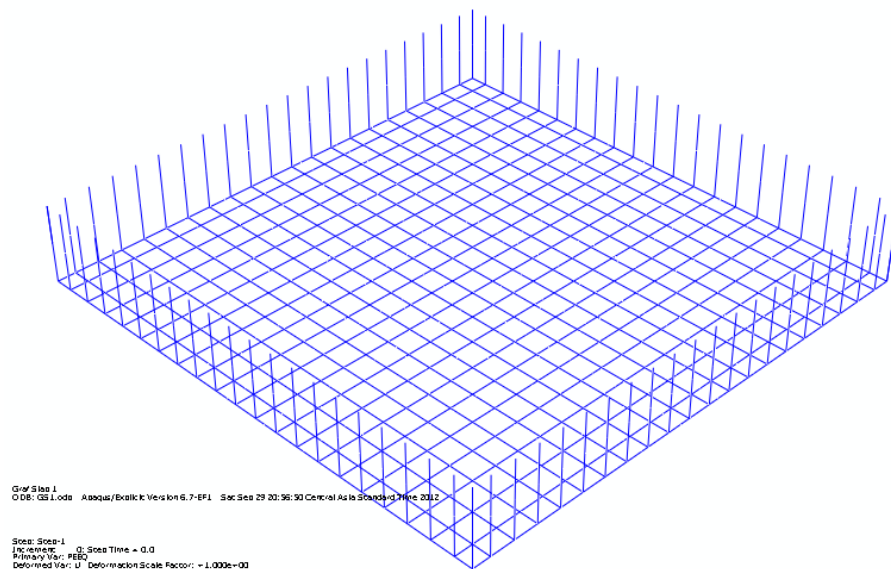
Typical tension reinforcement for G-1 and G-2 slabs
